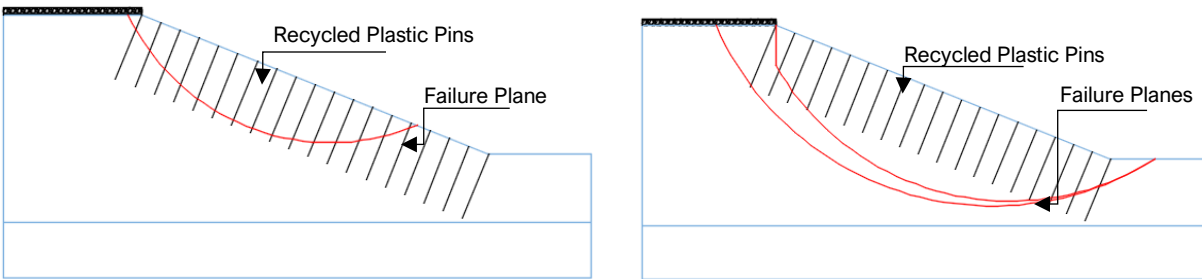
Slope Reinforced with RPP(a) Shallow Slope Failure.; (b) Deep Slope Failure.
